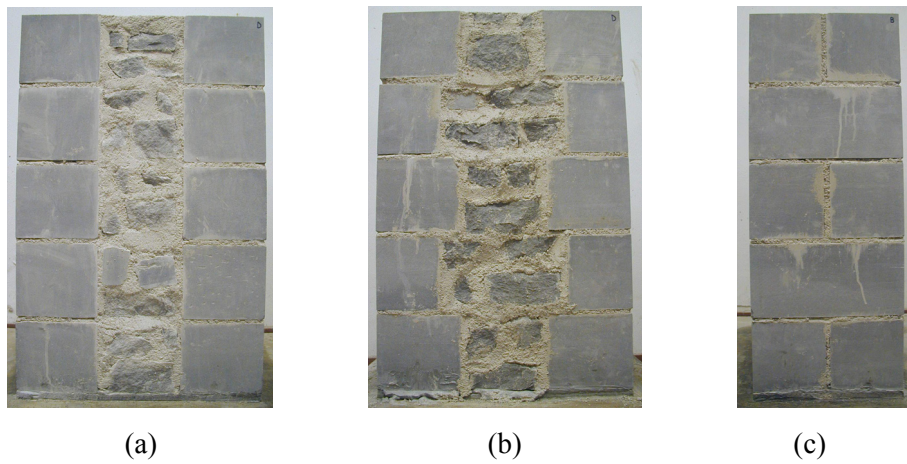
Serena* wallets: (a) front view of a specimen with straight collar joints, (b) front view of a specimen with keyed collar joints and (c) lateral view.
